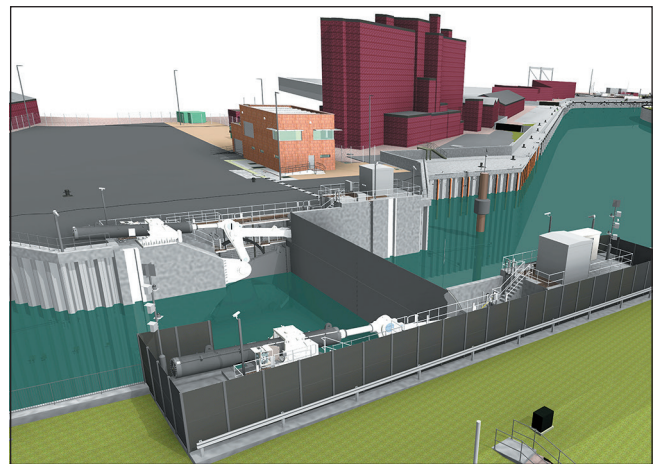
Building information model render of how the completed barrier and control building looks now (BAM Nuttall and Mott MacDonald joint venture)
